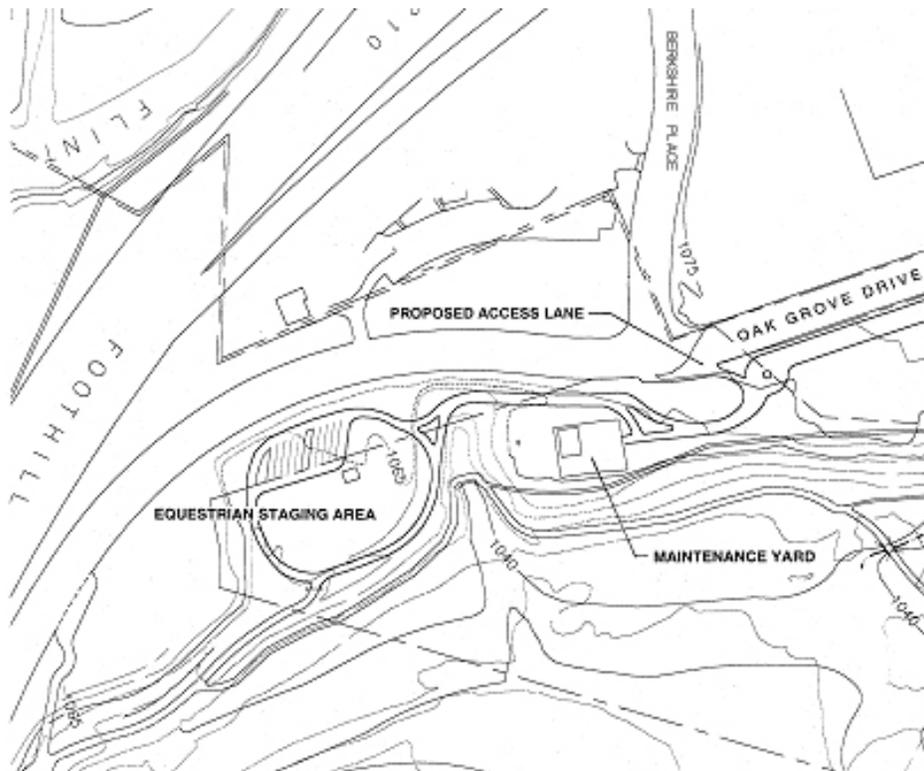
, Proposed Road Improvements to Equestrian Staging Area
